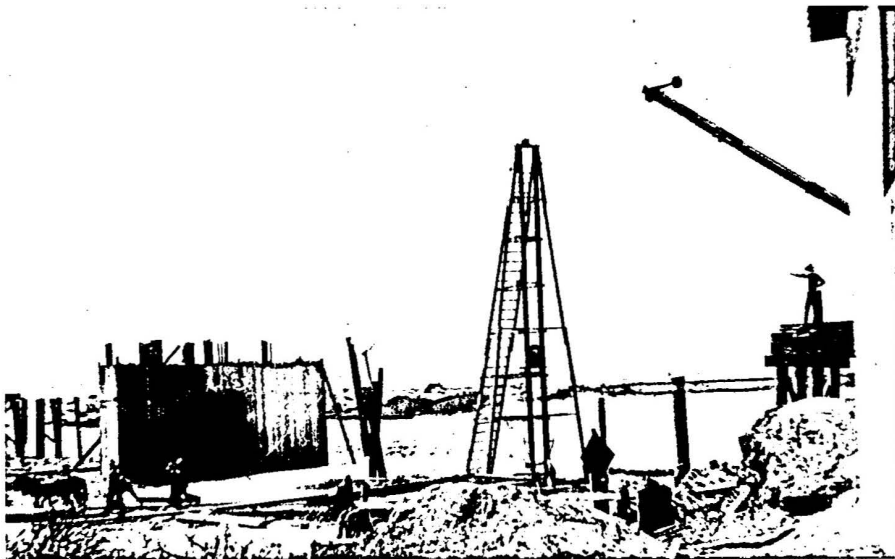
Rebuilding the Rio Puerco Bridge (No. 531) near Bernardo After the Flood of 1929. (Highway Department Bridge Files)
